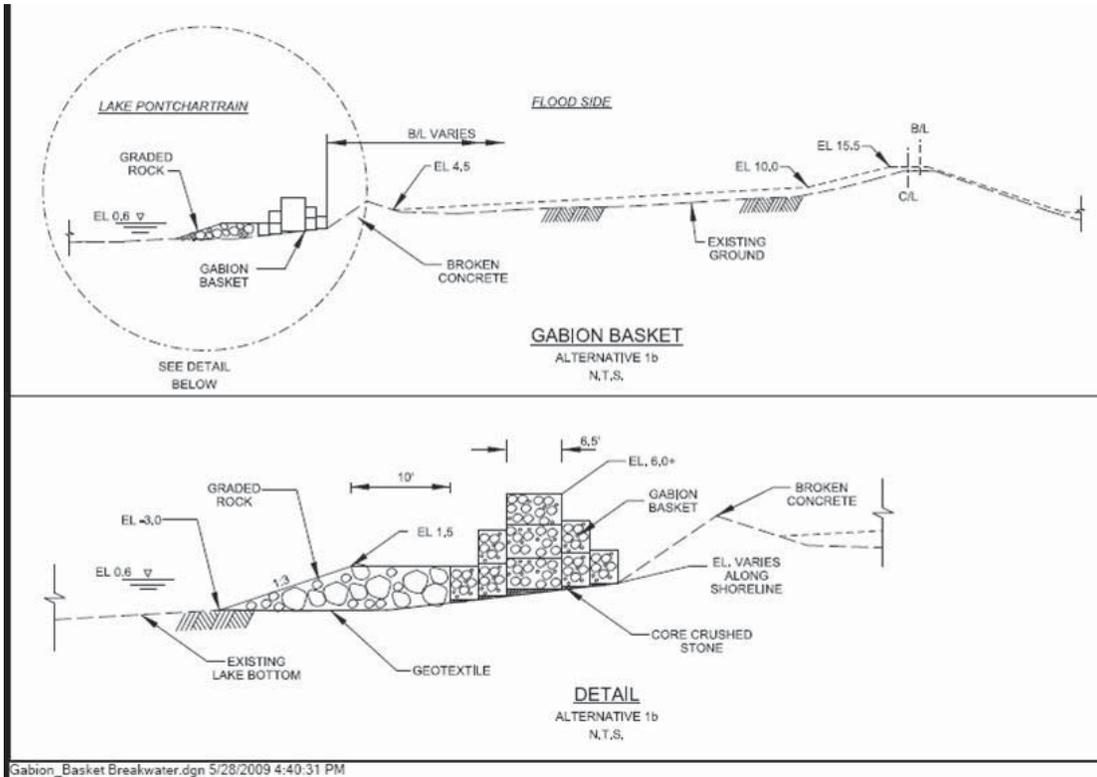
Alternative 2 – Gabion Basket breakwater cross-section.
